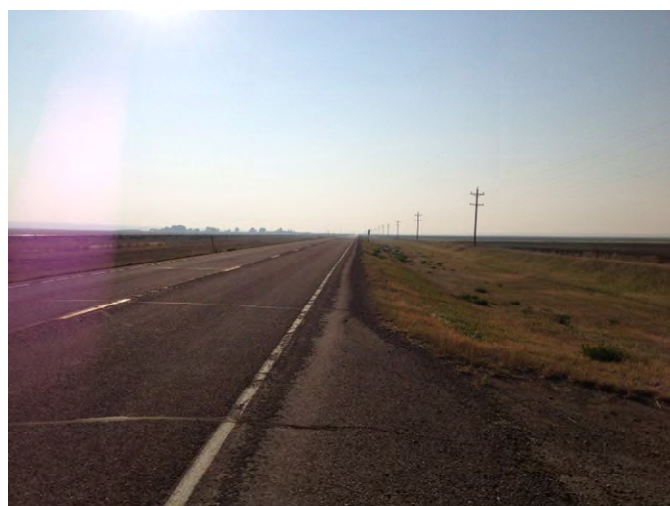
Segment 3, RP 293.9±, looking eastbound.
